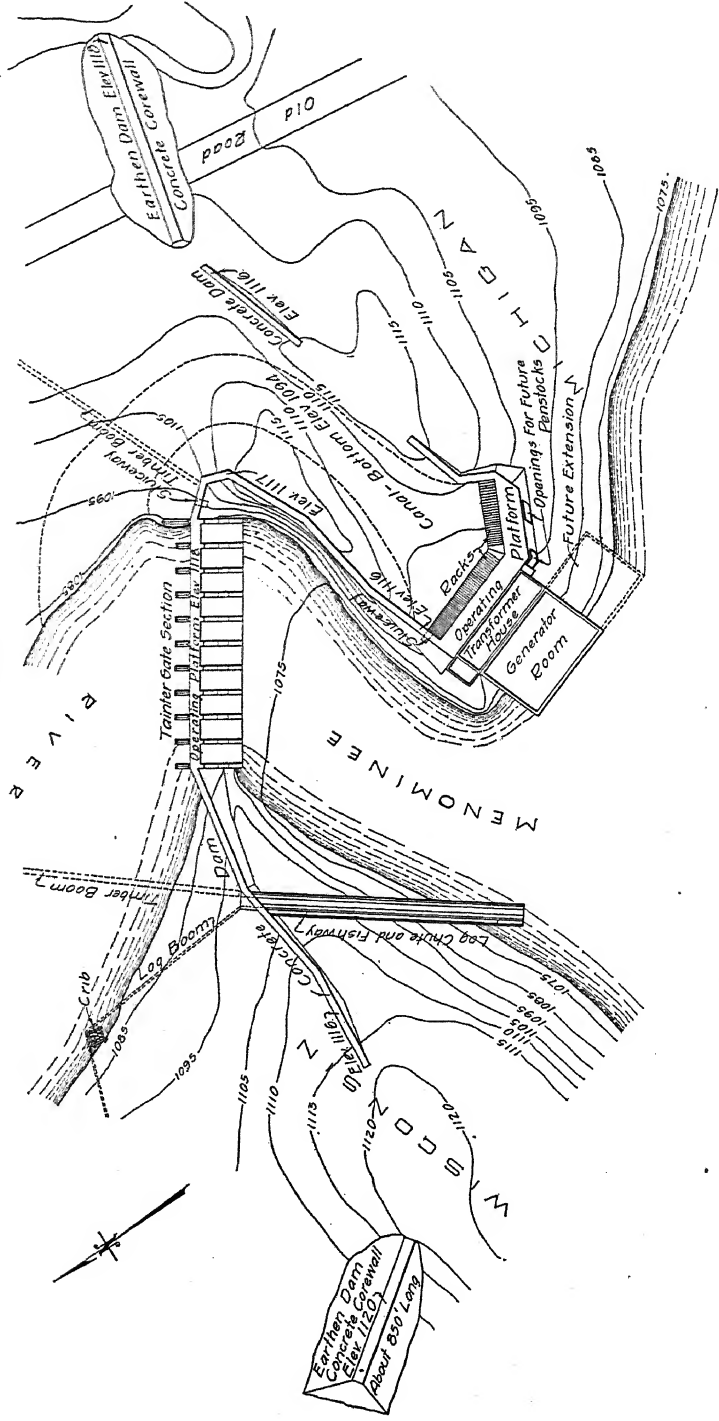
GENERAL PLAN OF THE TWIN FALLS PLANT OF THE PENINSULAR POWER CO.
